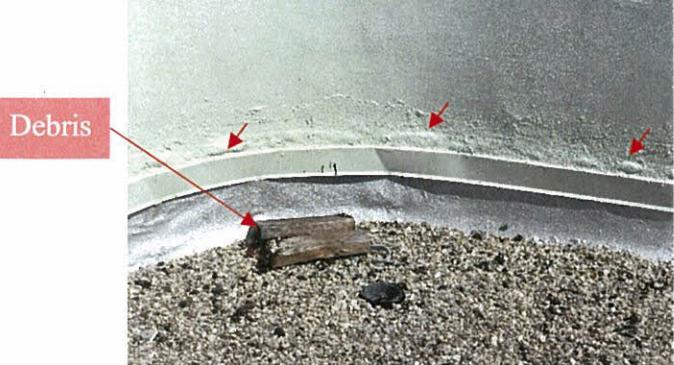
Blister at parapet wall above counterflashing from water intrusion via cracks at wall from the wind buffeting exerted to the building caused by Irma's strong wind pressures.
